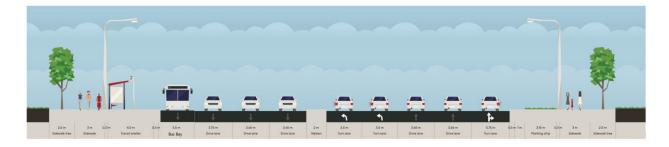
Arterial A2 – Recommended Cross-Section, Intersection
